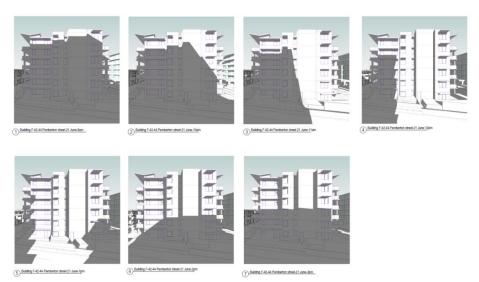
Elevational shadow of Building F at 42-44 Pemberton Street Botany
